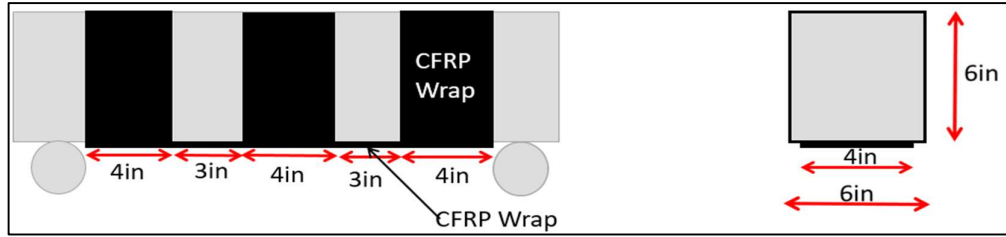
Side View of beams strengthened by CFRP wrap
